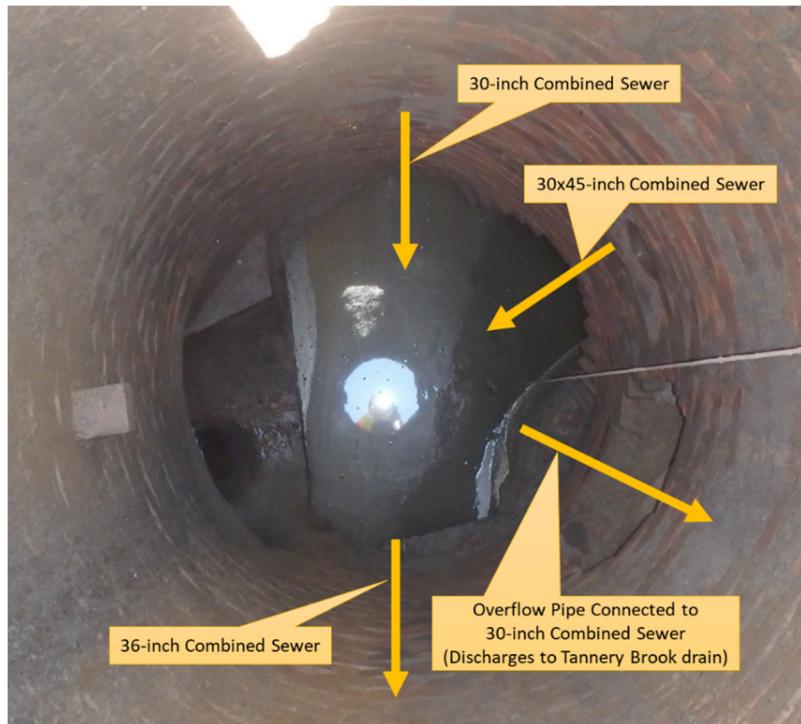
Manhole interior showing overflow pipe connection at Paulina St. and Holland St. (Photo taken from Somerville GIS – Manhole ID: CA-2397)
